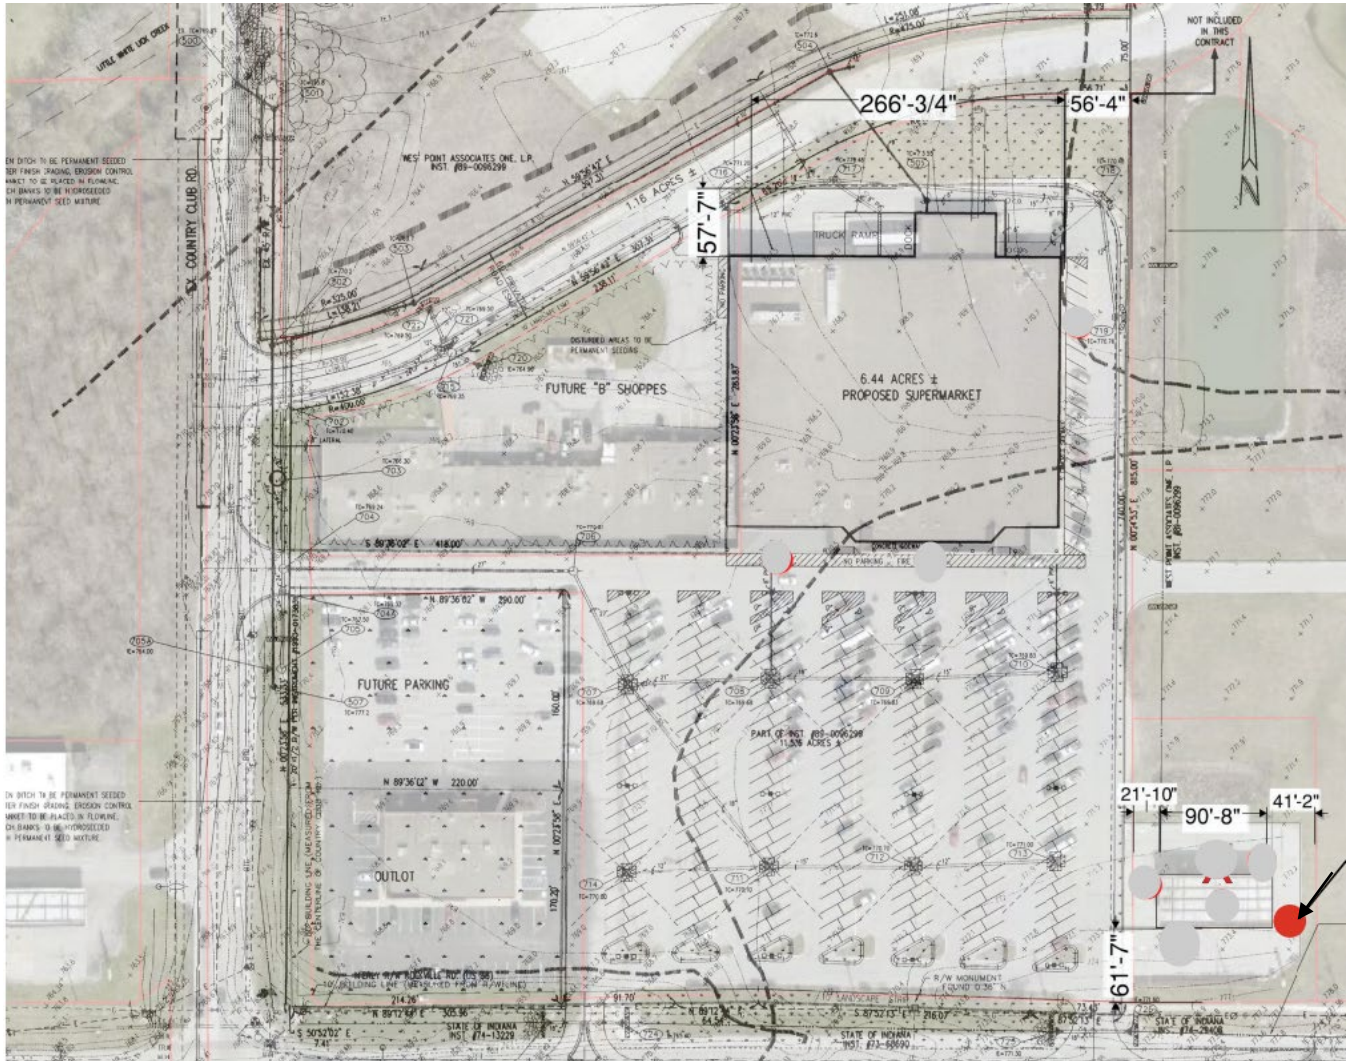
Site plan, location of the sign is indicated by the red dot.
